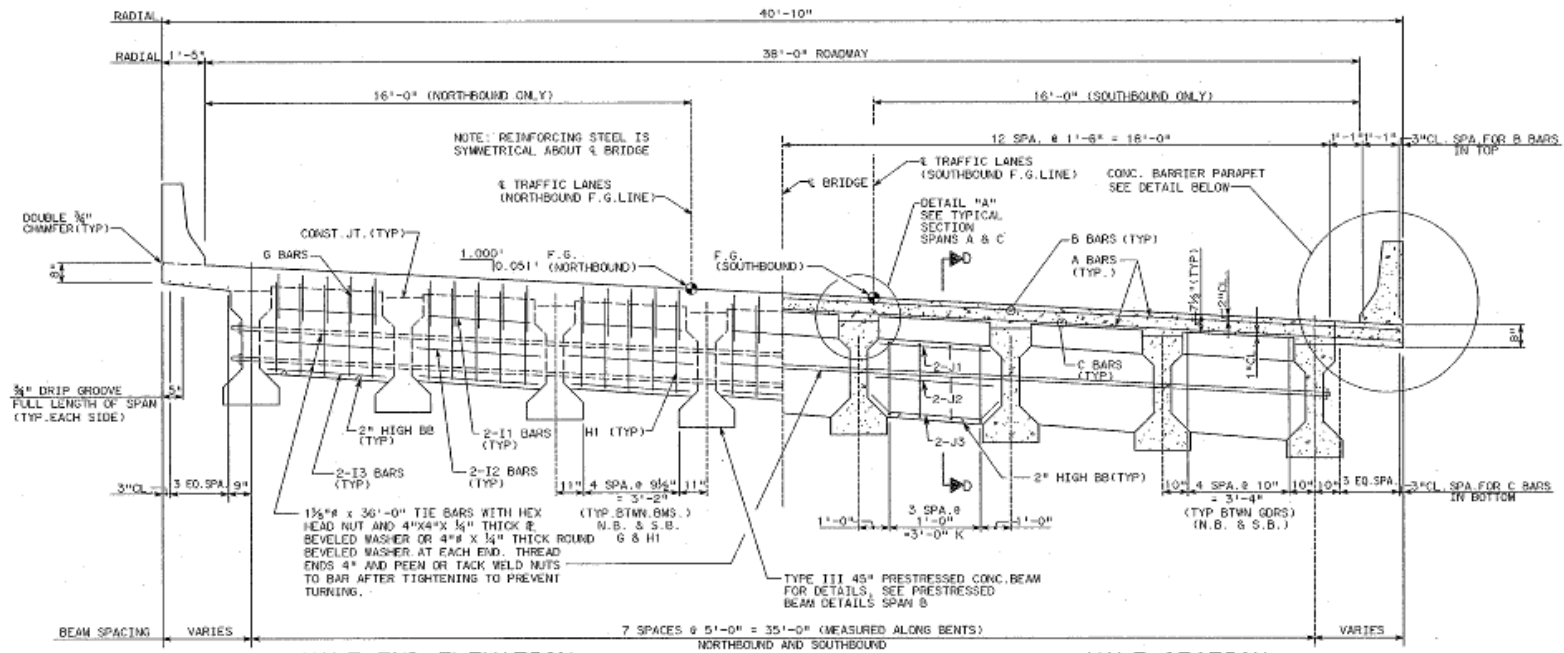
Cross-Sectional View of Archetype 3 Bridge
